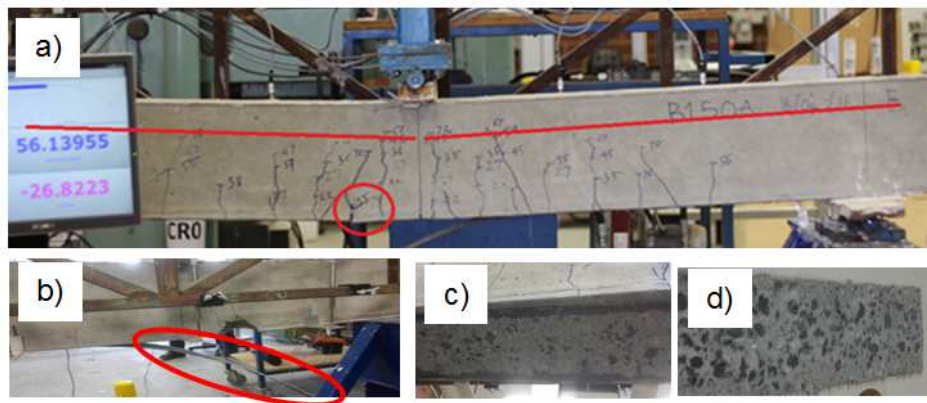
(a) Failure mode of specimen B150A (b) Debonded BFRP strip; (c) Concrete surface after debonding; (d) BFRP/concrete interface after debonding
